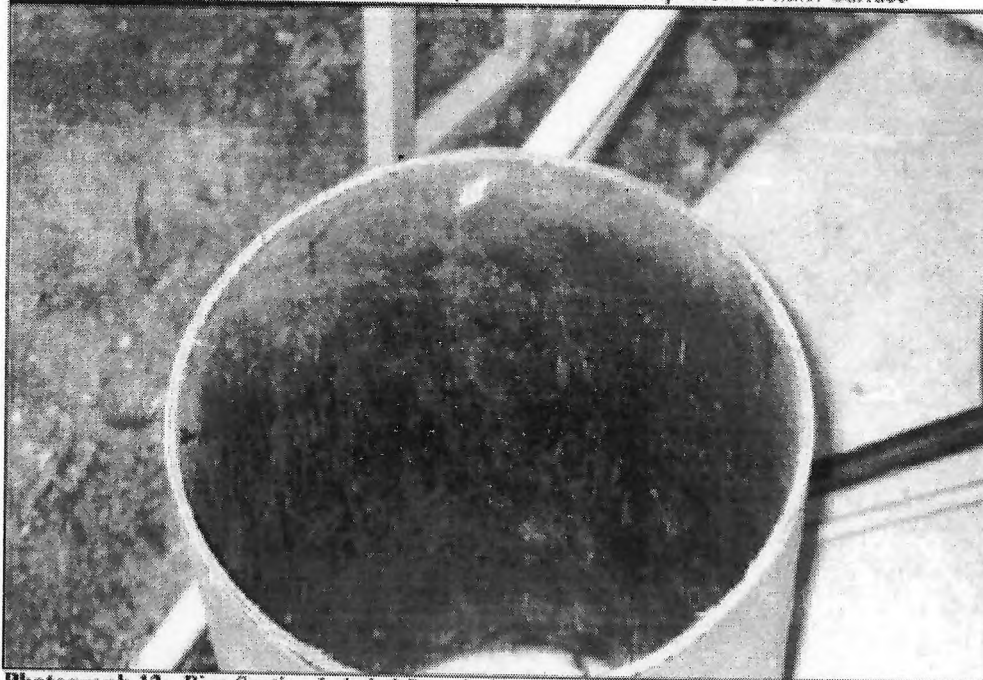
Pipe Section Labeled Sample 0191-04, Close-up View of Inner Surface
